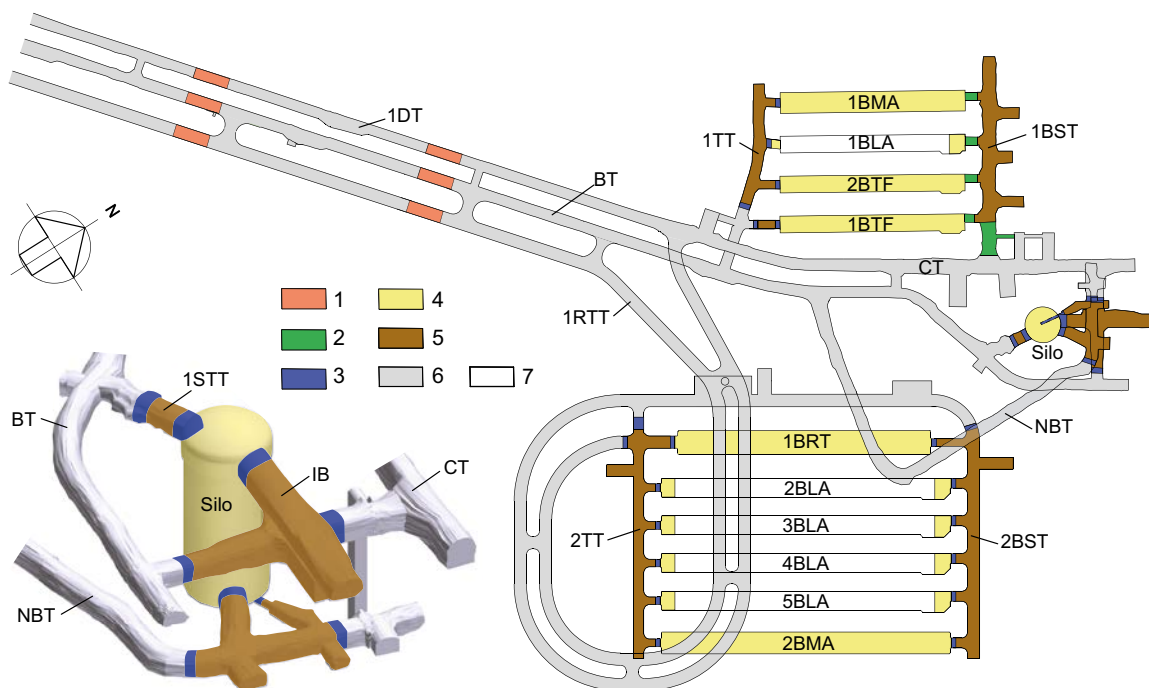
Schematic plan of SFR 1 and SFR 3, with a detailed view of the silo. Key to numbering: 1) Plugs in access tunnels 2) Transition material e.g. 30/70 bentonite crushed rock in earth dam plug 3) Mechanical plug of concrete 4) Macadam backfill 5) Hydraulically tight section with bentonite 6) Backfill in access tunnels and tunnel systems 7) Non-backfilled openings. Note that the figure shows Layout 2.0; Layout 1.5 is used in SR-PSU modelling. The only difference relevant to this figure is that BRT is longer here than in Layout 1.5. The labels in the figure are referred to in the text.
